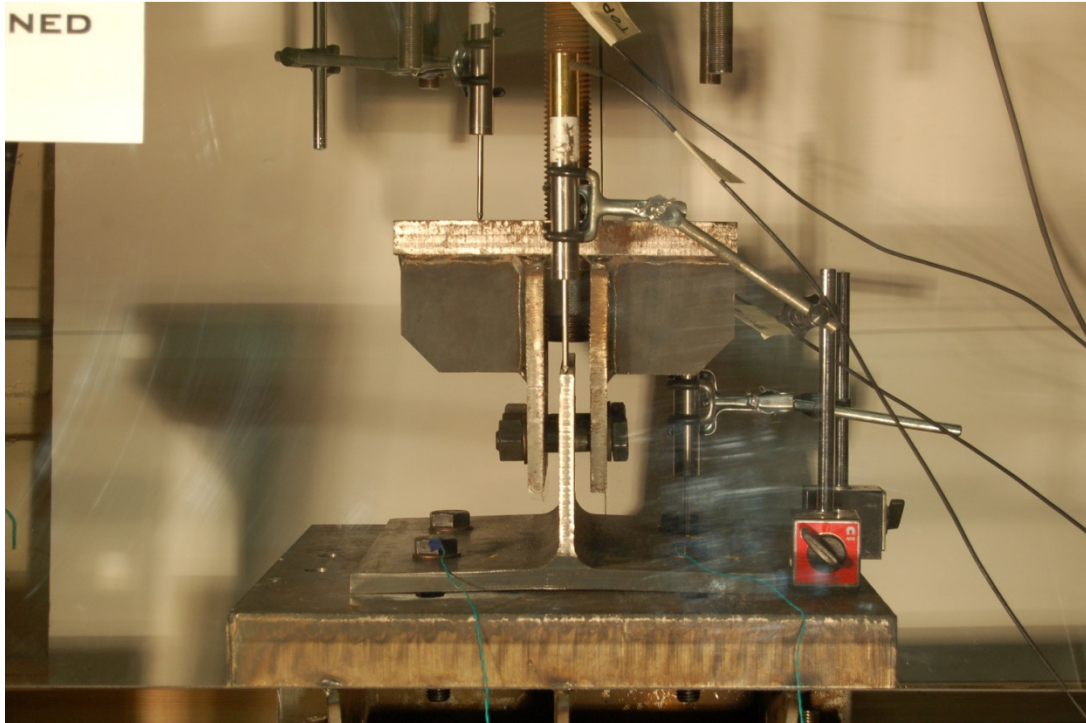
Deformed Shape for Specimen 2.0b at 100 kips Applied Load.
